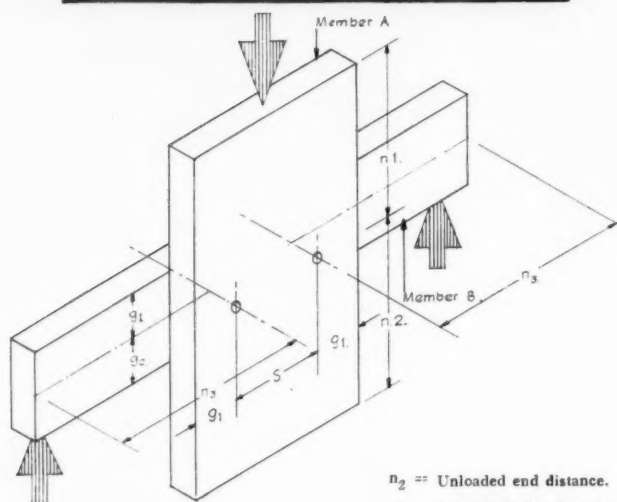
(top left) Toothed connector embedded with ball-bearing washer assembly. Fig. 5 (bottom left) Standard dimensions in the design of joints. Fig. 6 (above) Split-ring connector and groove-cutting tool. Fig. 7 (below) Stress distribution of split-ring connector.
